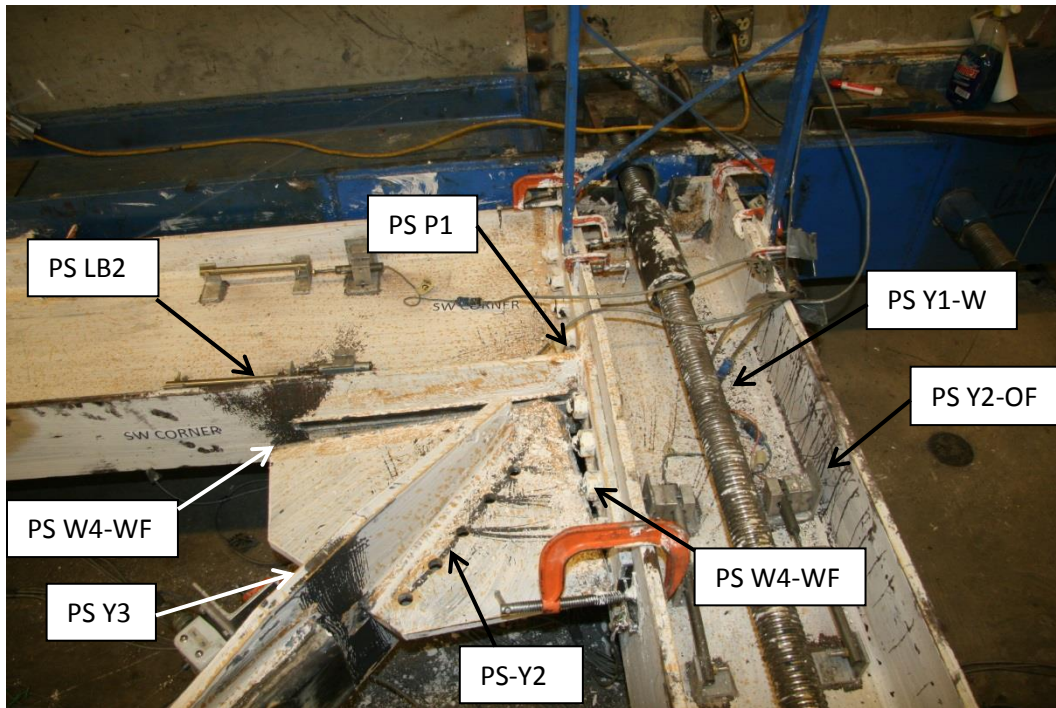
Damage in SW Corner at End of Test (3.9%)
